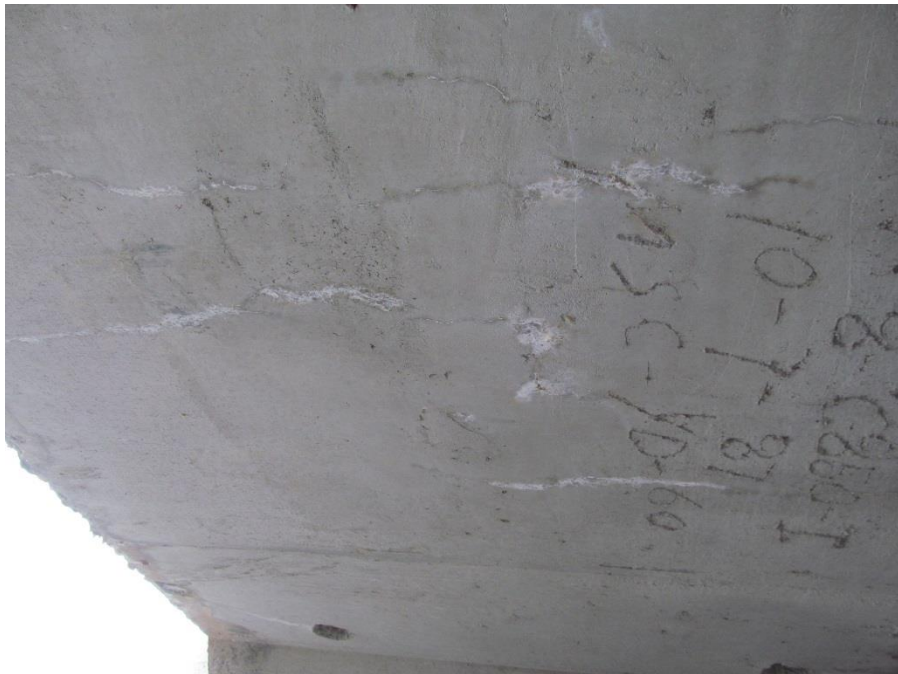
Area of soffit concrete cracking with efflorescence near the southeast corner of the culvert.
